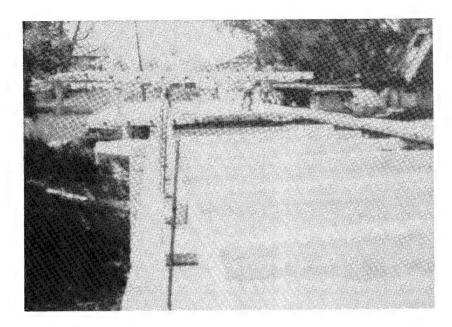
Precast panel placement, Dublin Scioto Bridge (from PCI 1988)
